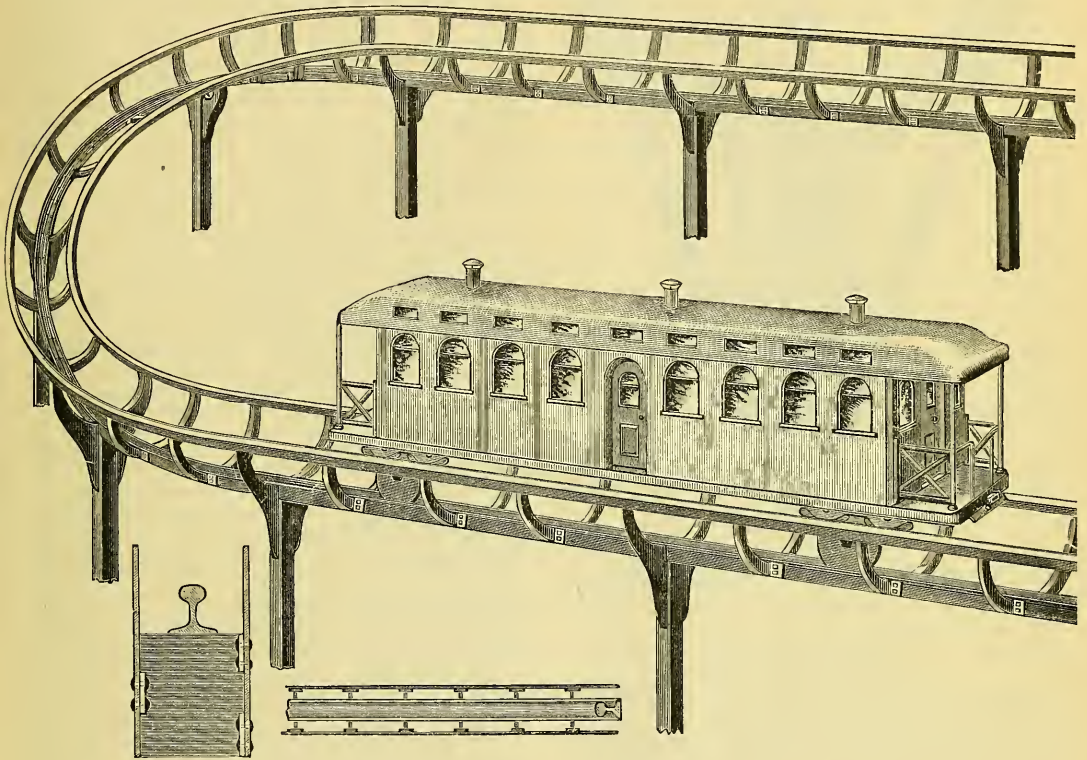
THE WHITE ELEVATED RAILROAD.
